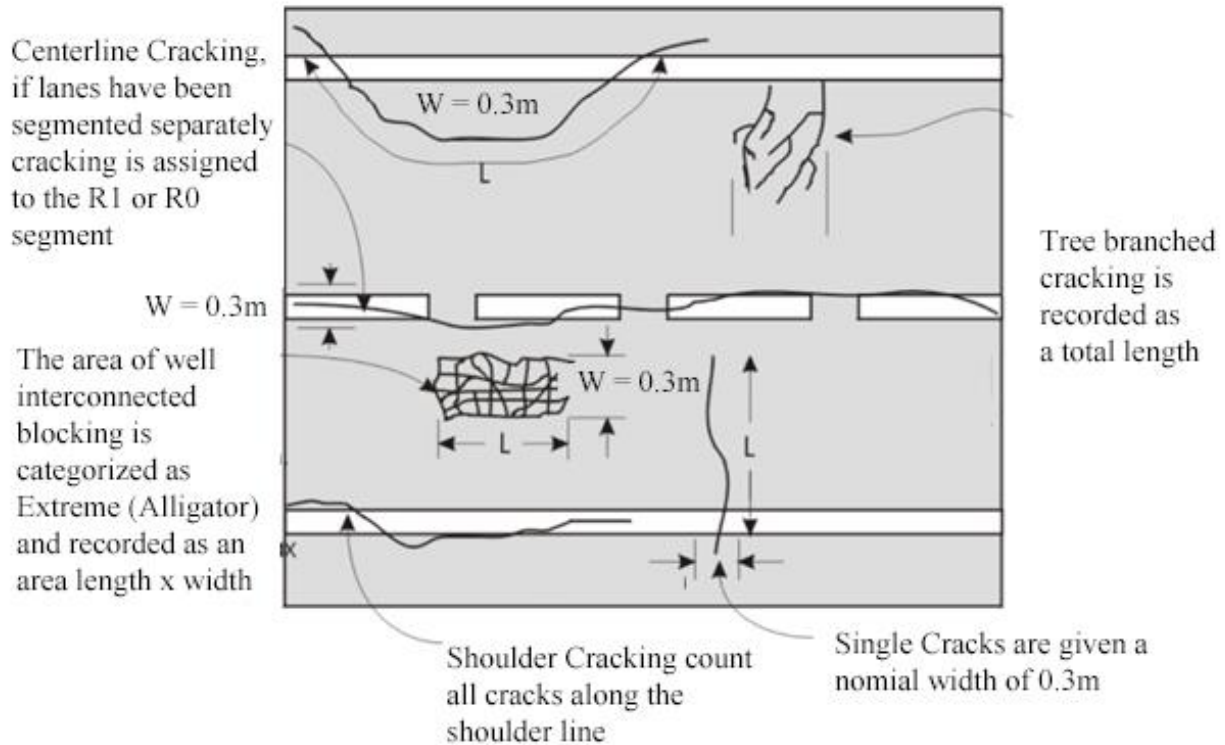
Pavement cross-section with mixed cracking (modified from Alberta Transportation 2003)
